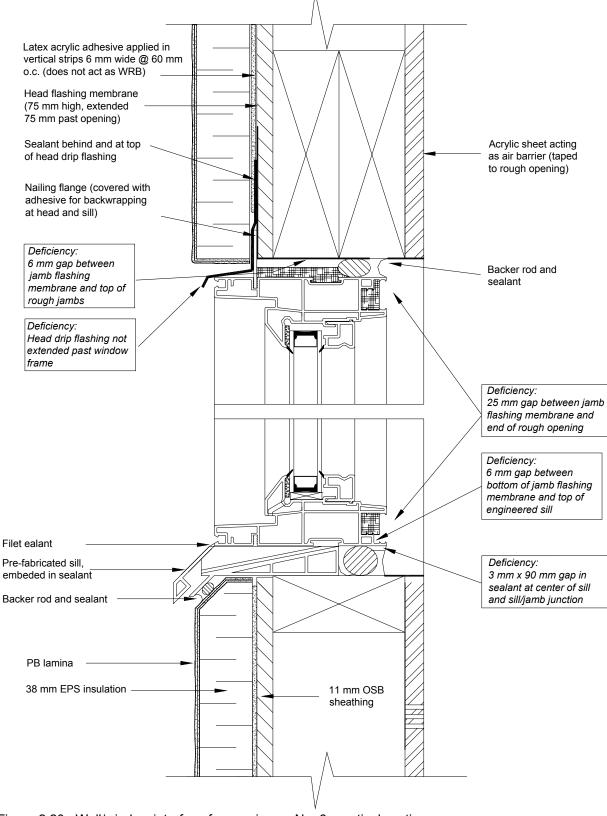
Wall/window interface for specimens No. 6 - vertical section
